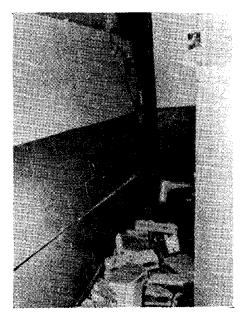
Damage to non-structural block walls, Elmendorf Air Force Base, during the 1964 Anchorage Alaska earthquake.
